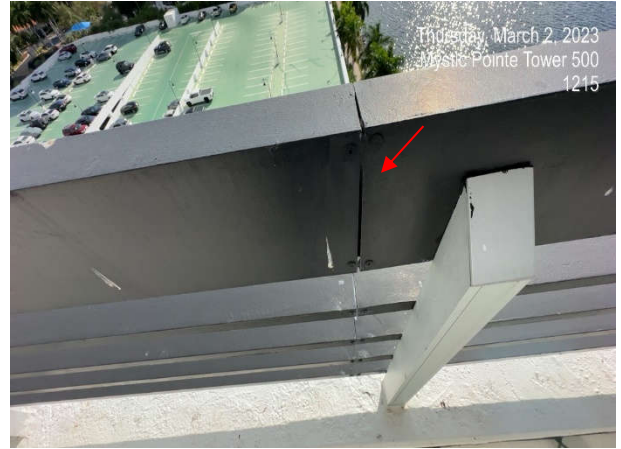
Gap between railing connection (Unit 1215)
